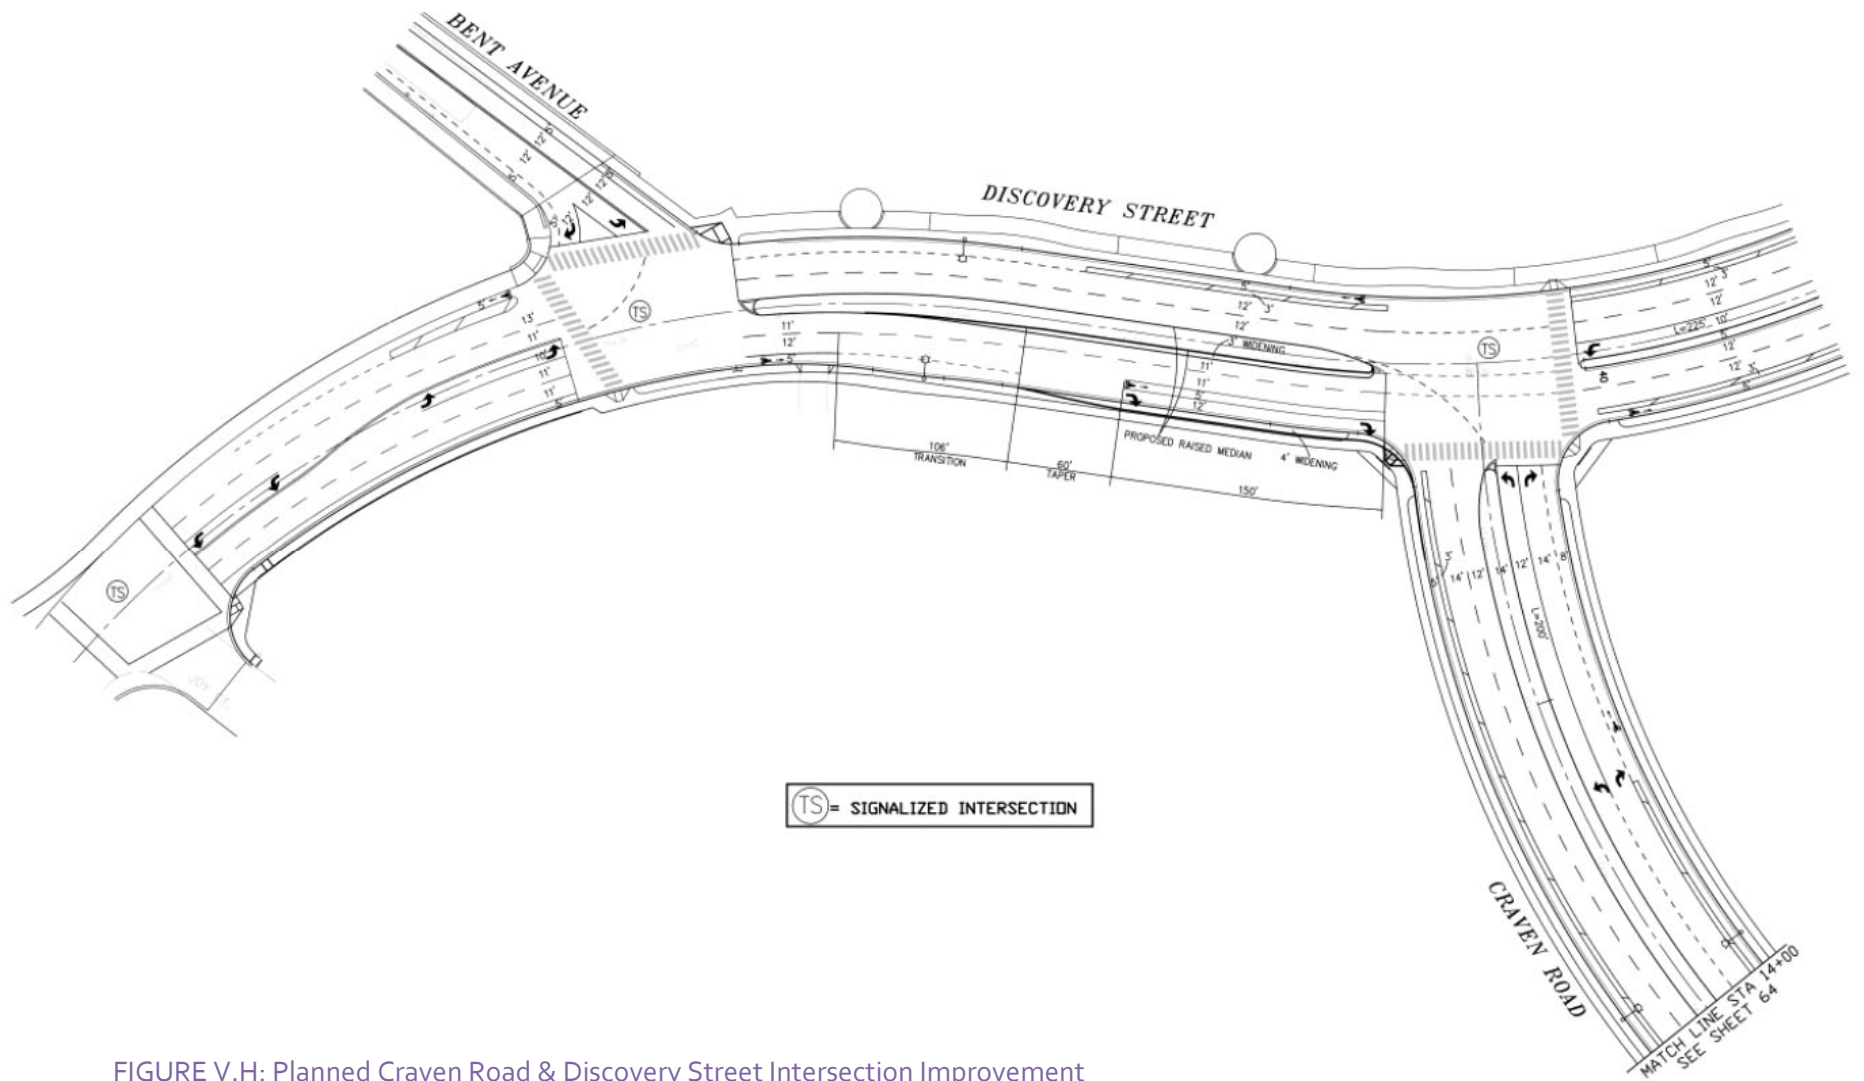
FIGURE V.H: Planned Craven Road & Discovery Street Intersection Improvement
